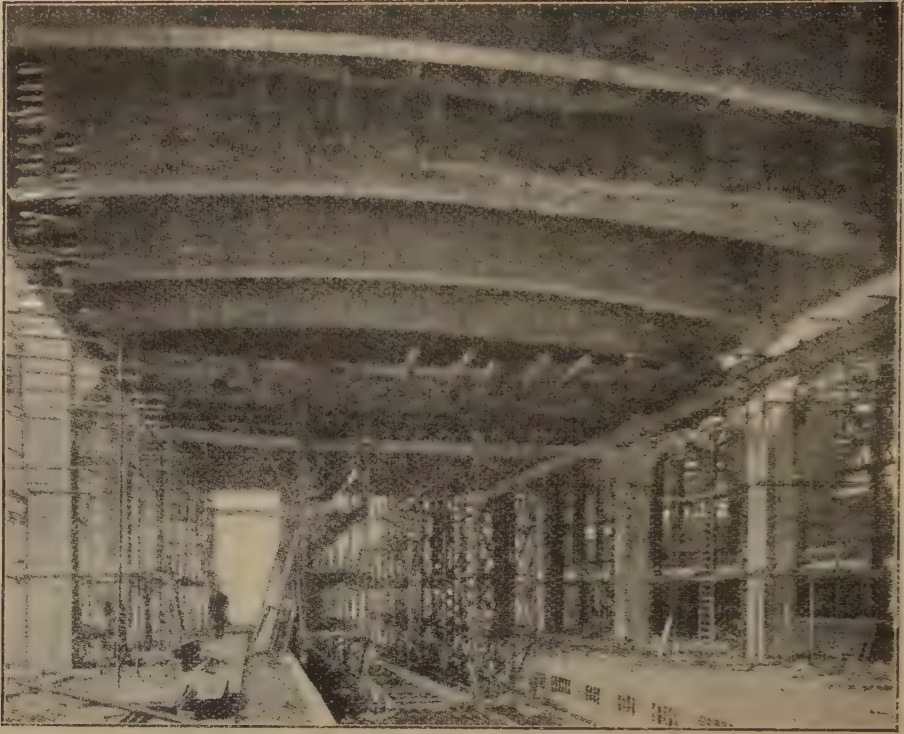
Goods depot at South Lambeth, Great Western Railway, Great Britain.
